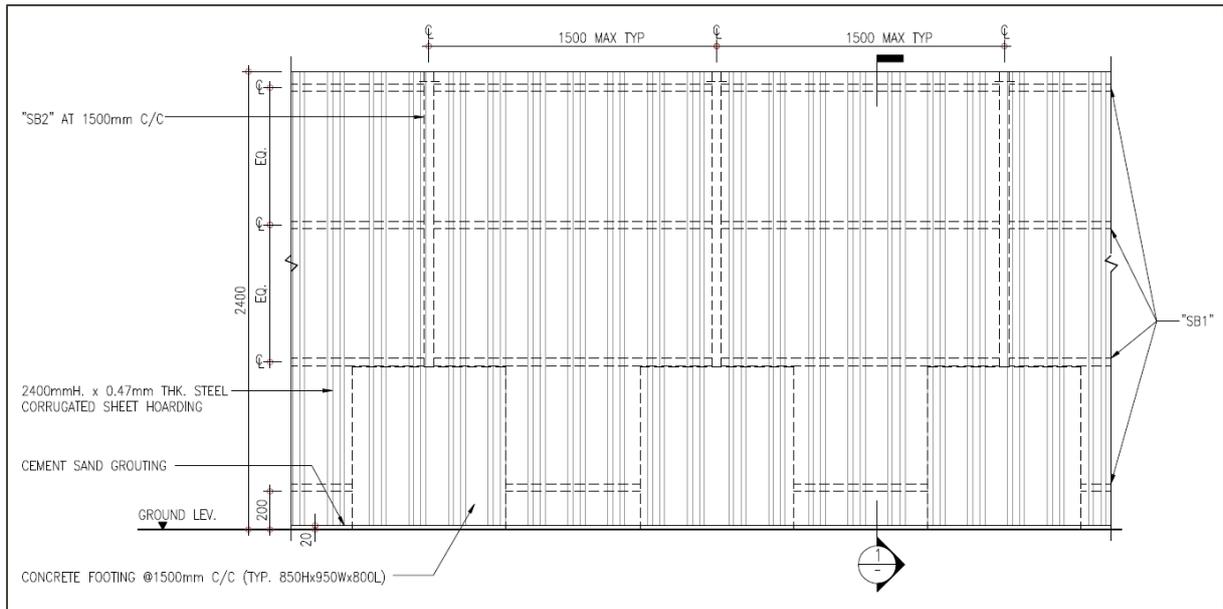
Proposed Design of Footing and Closed Boarding for Temporary Hoarding (Front View)
